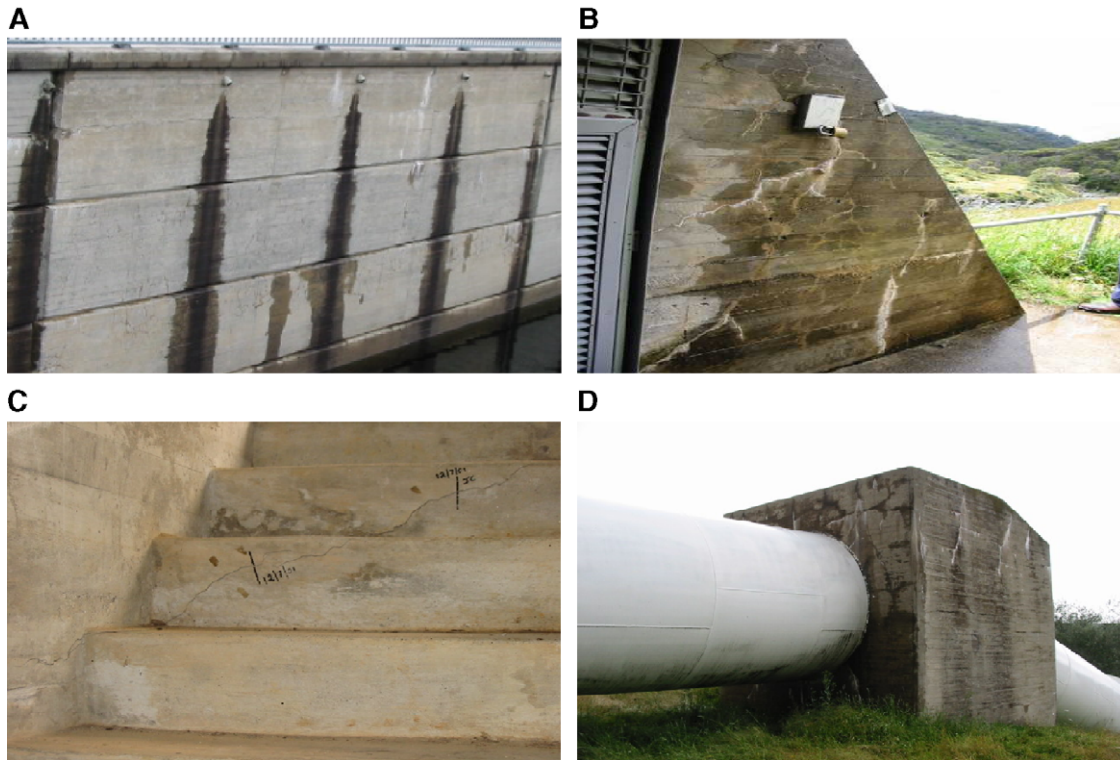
(A) Milder cracking in the upstream face of the middle block to the left of the spillway. (B) Cracking of the buttress at the gallery entrance, due to AAR. (C) Cracking in the wall and staircase of the gallery—left entrance from downstream. (D) View of the pipeline anchor block exhibiting cracking.
